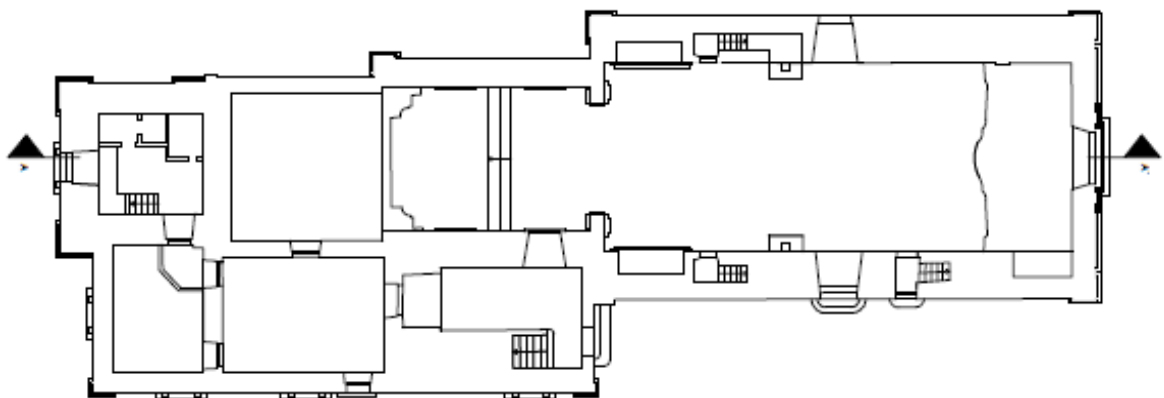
Floor plan of the church São Vicente (Betzer et al., 2014).
